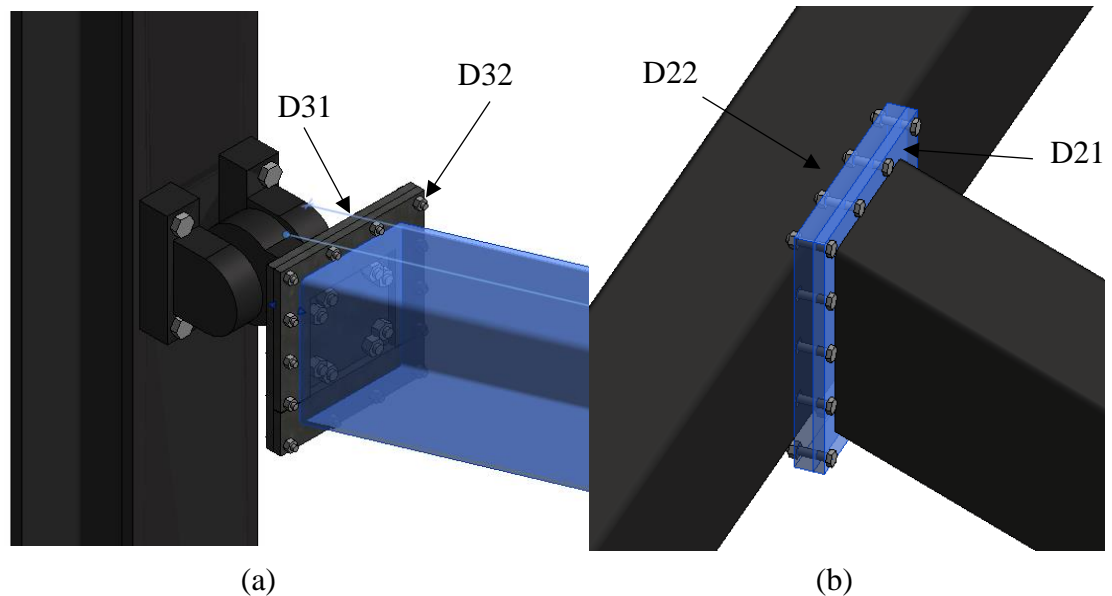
Connection details: (a) Connection C1 at Detail 03 (b) Connection C2 at Detail 02
